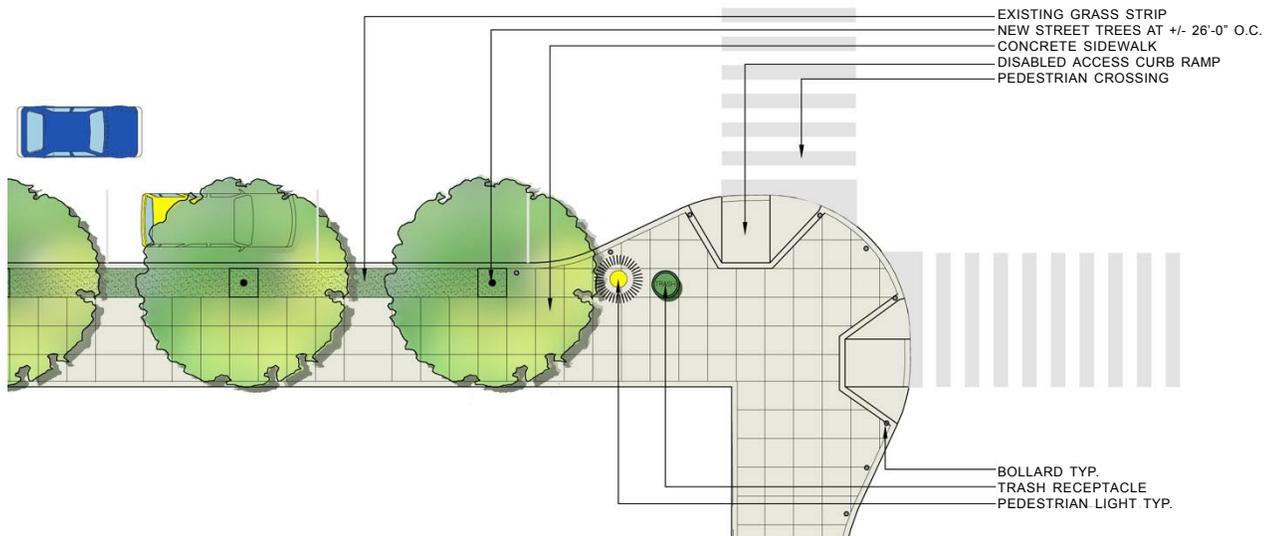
Pedestrian Corridor Improvements - Corner Sidewalk Extension
